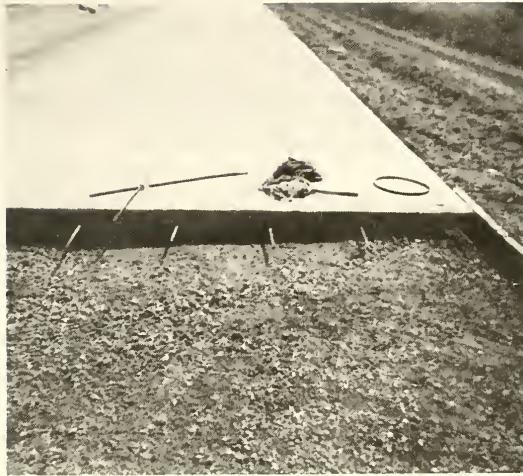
CONSTRUCTION JOINT IN CONCRETE SHOULDER
